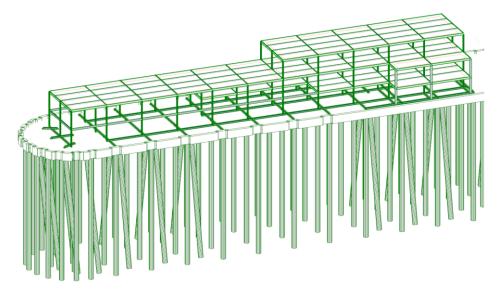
Proposed structure over St. Michael's Pier [extract Structural Analysis Model]
